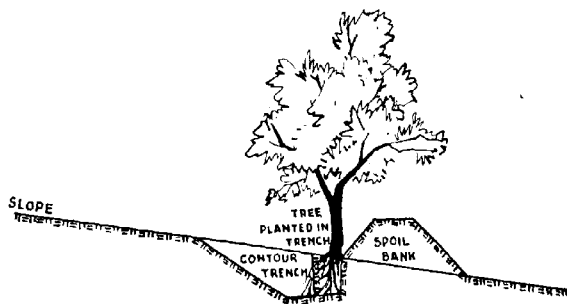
TYPICAL SECTION OF A CONTOUR TRENCH AS EXCAVATED IN THE BIJAPUR DISTRICT.
